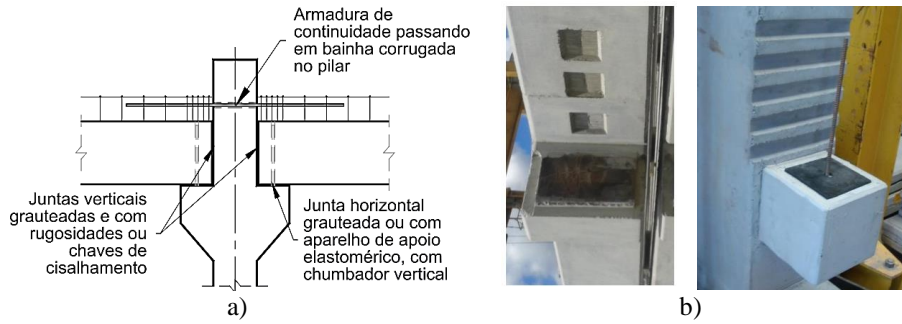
Shear keys in beam-column connections in precast concrete structures. Source: [6] ABNT NBR 9062:2017
